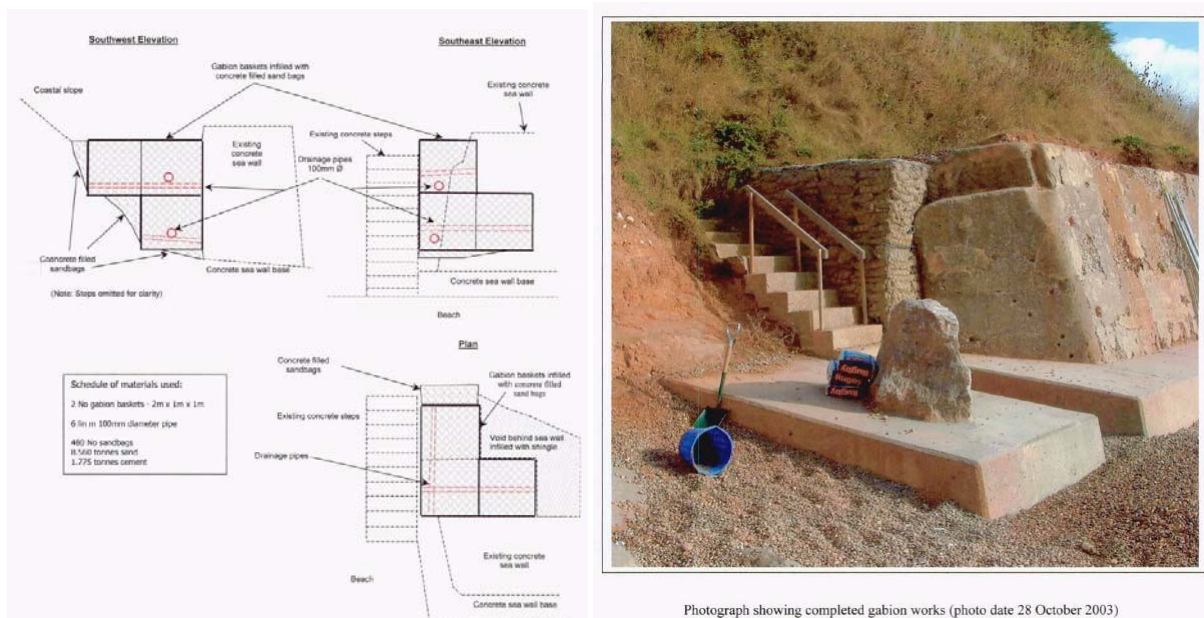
Side elevation plan of the emergency gabion works west of Check House Wall
